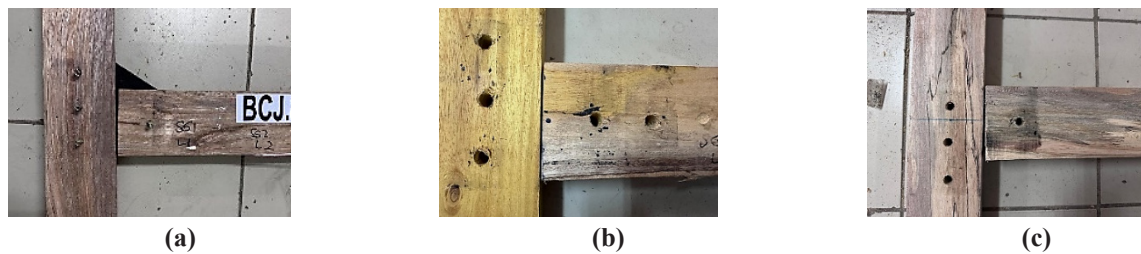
Failure Patterns of the Beam-To-Column Joint Specimens Using 12 mm Bolts. (a) Specimen Using 8 mm Bolts. (b) Specimen Using 10mm Bolts. (c) Specimen Using 12 mm Bolts.
